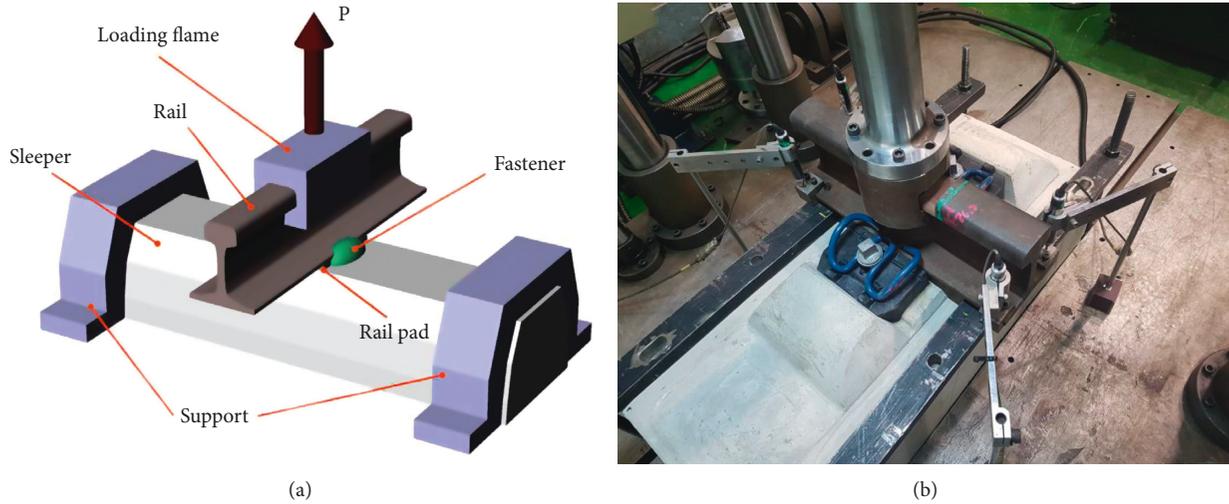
Clamping force test of fastening system. (a) 3D picture for understanding. (b) Real test for System 300-1 fastener.
